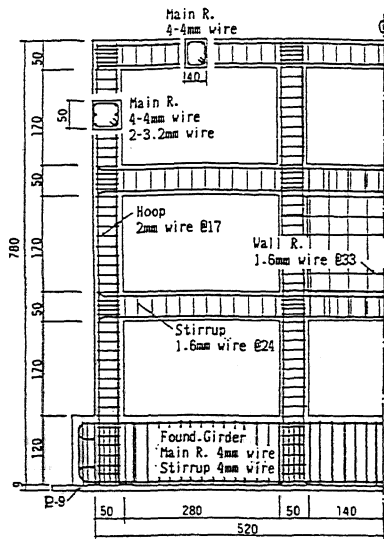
Typical Bar Arrangement (Specimen 1W-1)
